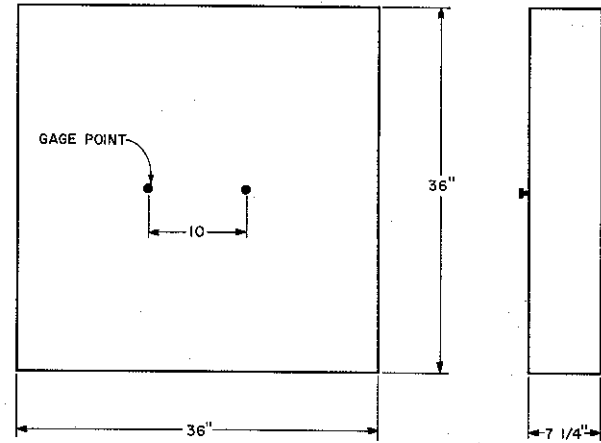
SLAB GAGES AND SHRINKAGE SPECIMEN
